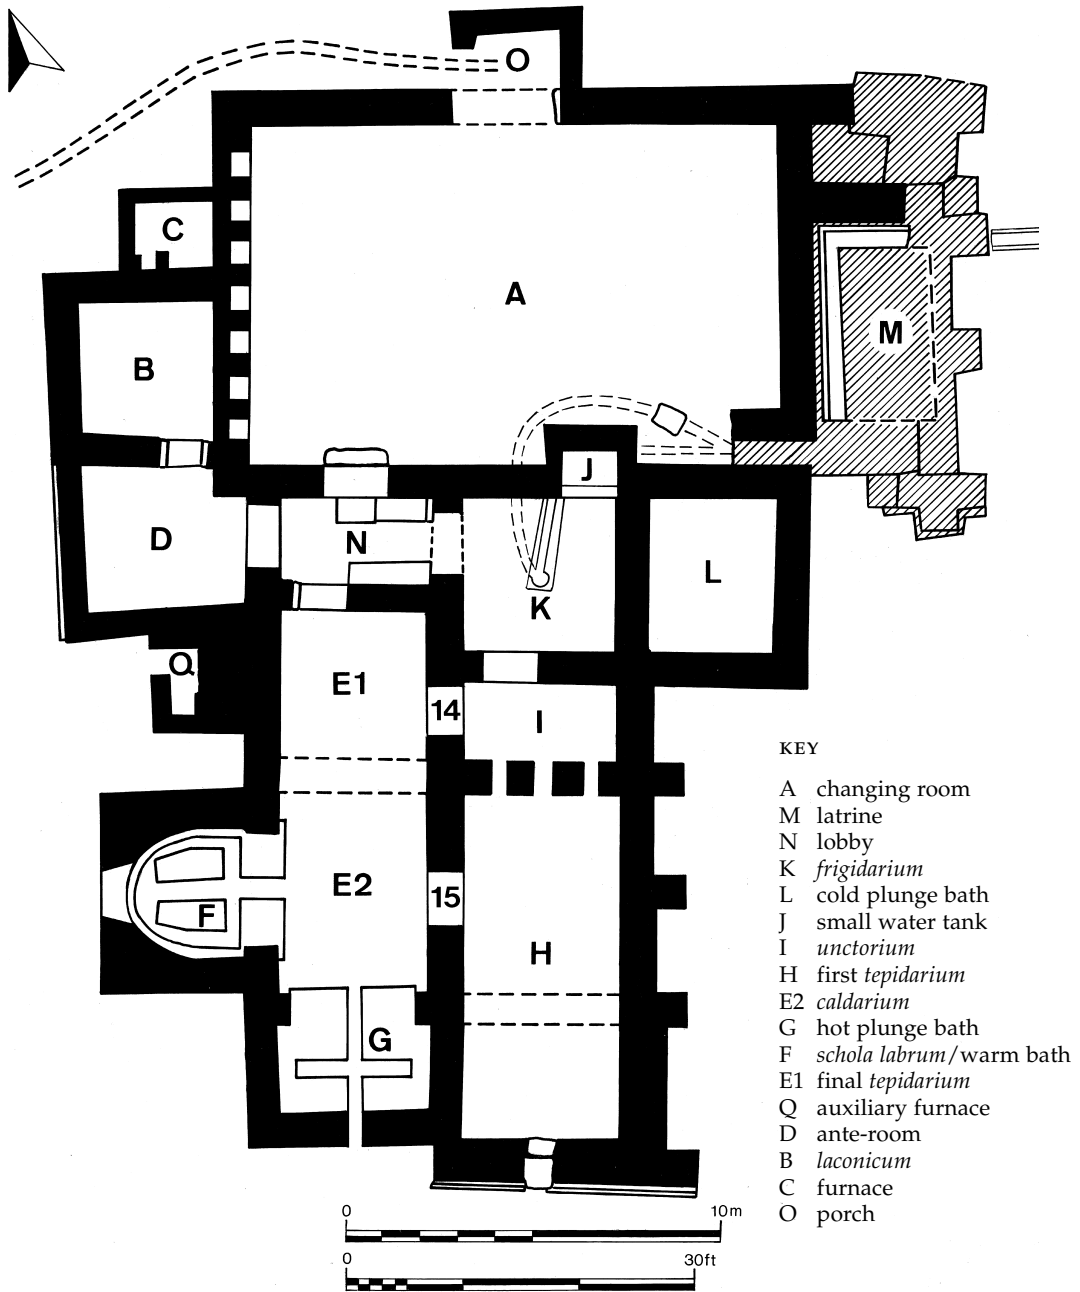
Plan of the surviving remains of the bath house. (Surveyed by TWAM Archaeology Department in 1997. Lettering and numbering as plan by W. Parker Brewis in Macdonald 1931, plan facing p. 304). Masonry shown in black, foundations hatched. Dashed lines indicate demolished walls and course of drains. Scale 1:200.
